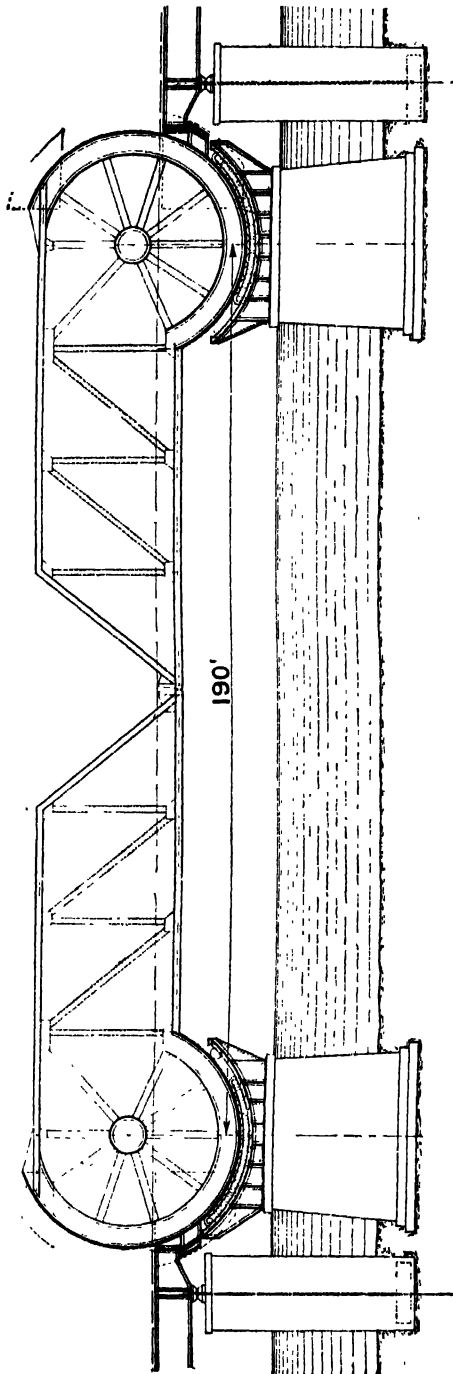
Proposed Roller-bearing Bascule Bridge over the Chicago Drainage Canal.
